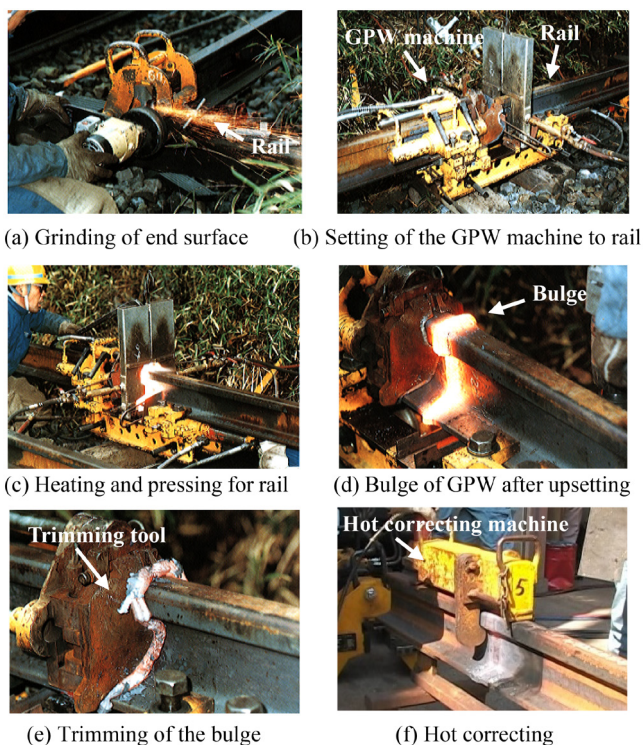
Gas pressure welding (GPW) procedure for rail
